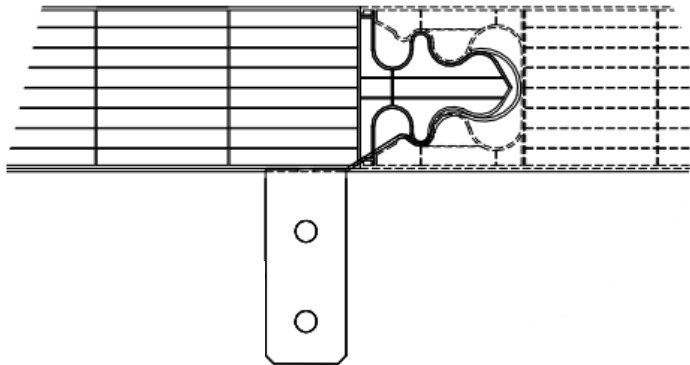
example for multi-layer sheet with lift anchor/stainless steel fastener (section)
